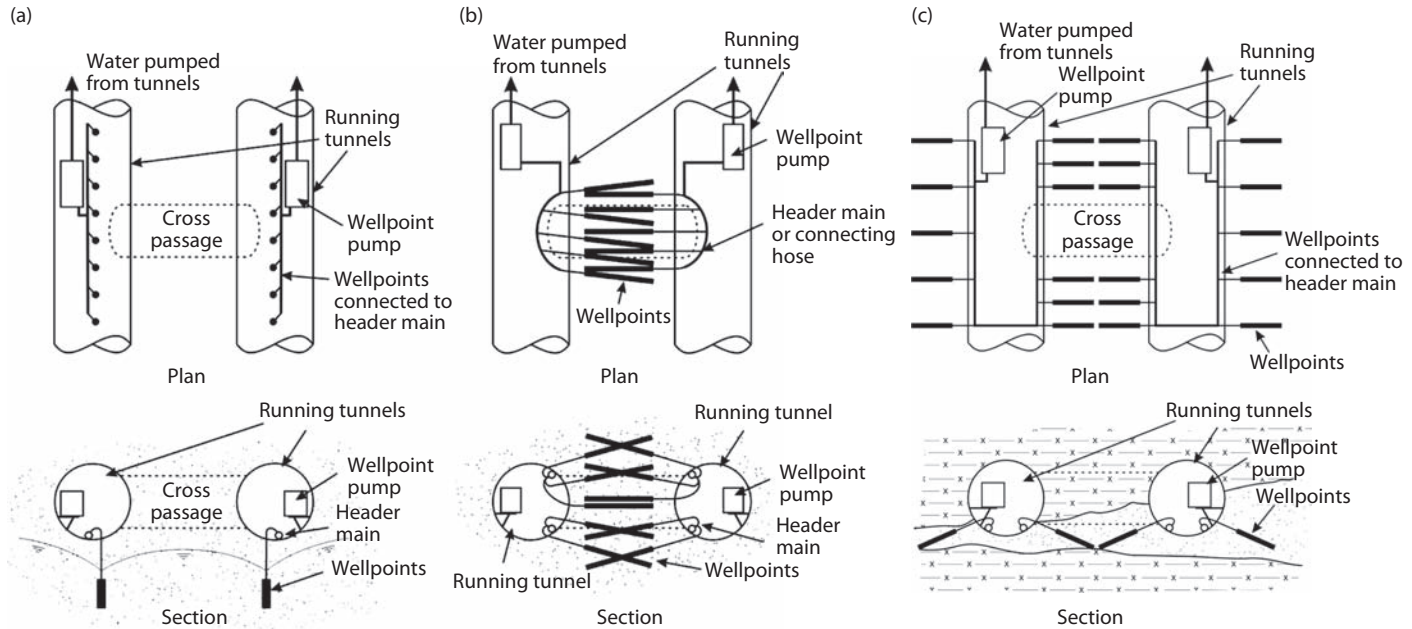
Array of wellpoints used for tunnel cross passage construction. (a) In uniform deposits of moderate permeability vertical or inclined wellpoints installed from invert of main tunnels may be able to reduce pore water pressures sufficiently to allow cross passage construction. (b) In uniform deposits of low permeability materials such as silts, wellpoints will need to be installed at close spacings in a fan around the space where the cross passage is to be constructed. (c) In deposits of variable permeability inclined wellpoints are installed from the main tunnels at a level and orientation where they are likely to intercept the permeable layers which require depressurization.
